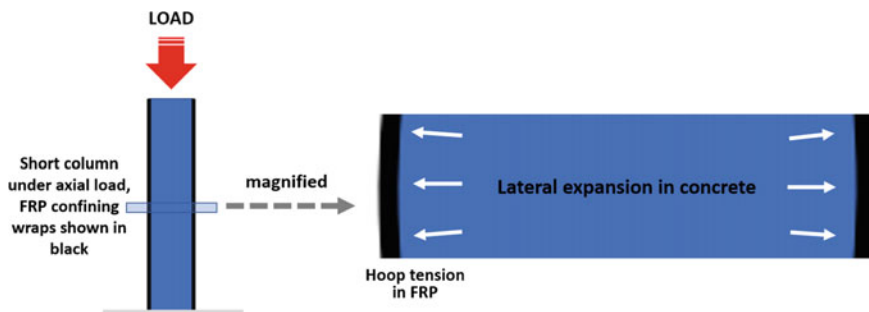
Confining FRP wraps on short column. Dilation of concrete generates Hoop tension in FRP
